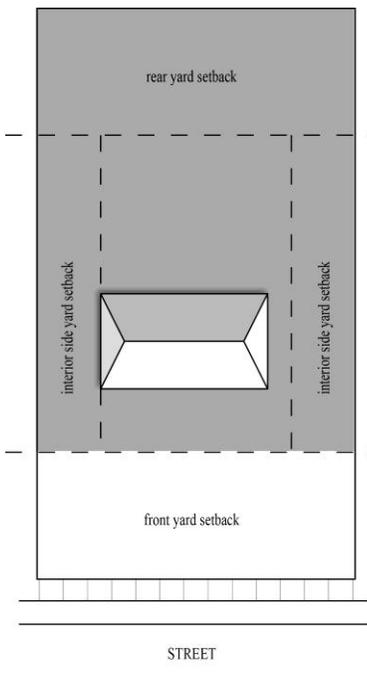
Residential Parking Locations: Interior Lot. Parking is allowed in shaded areas and on driveways in approved locations.
